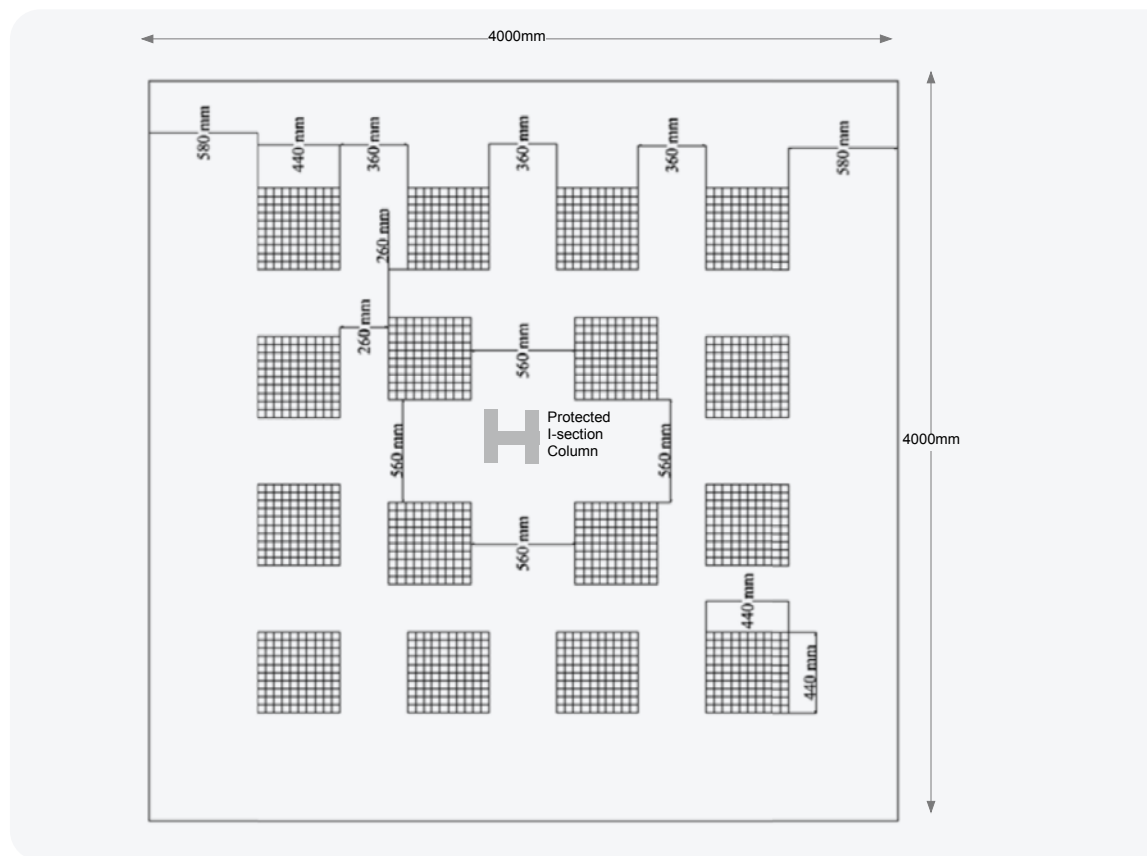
Plan of test enclosure showing crib layout and target fire-protected column.
